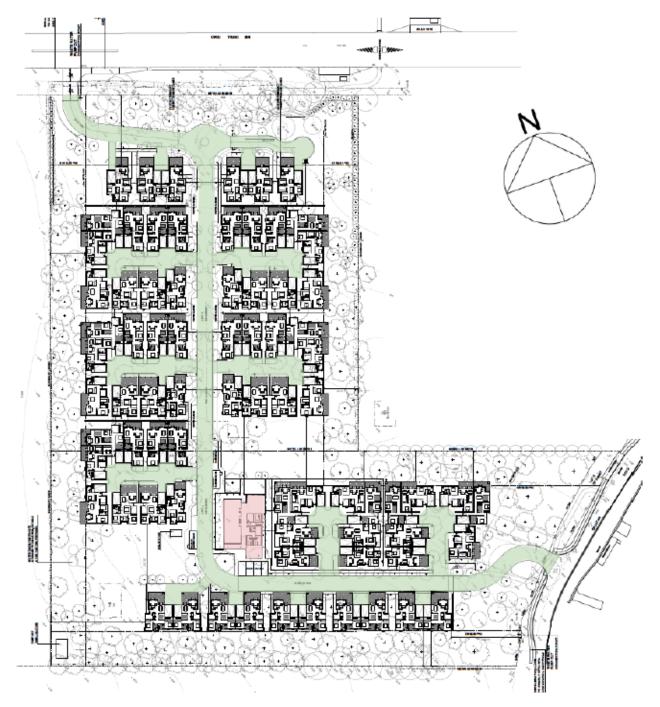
Site plan of the Land and Environment Court-approved development application - 76 single-storey dwellings.
